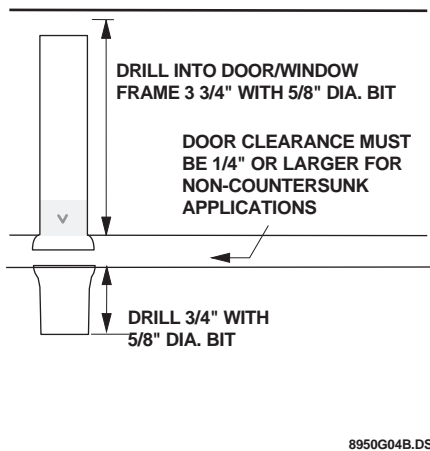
Optional Method: Non-Countersunk Mounting Dimensions
